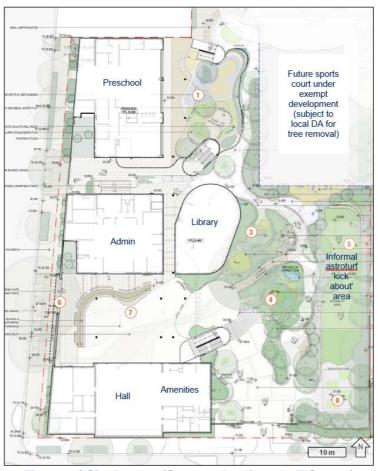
| Site Layout (Source: Applicant's EIS 2020)
